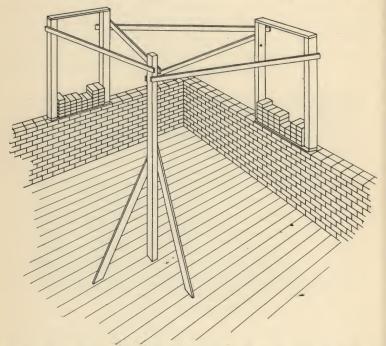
Method of bracing window frames to allow room for scaffold beneath braces.
